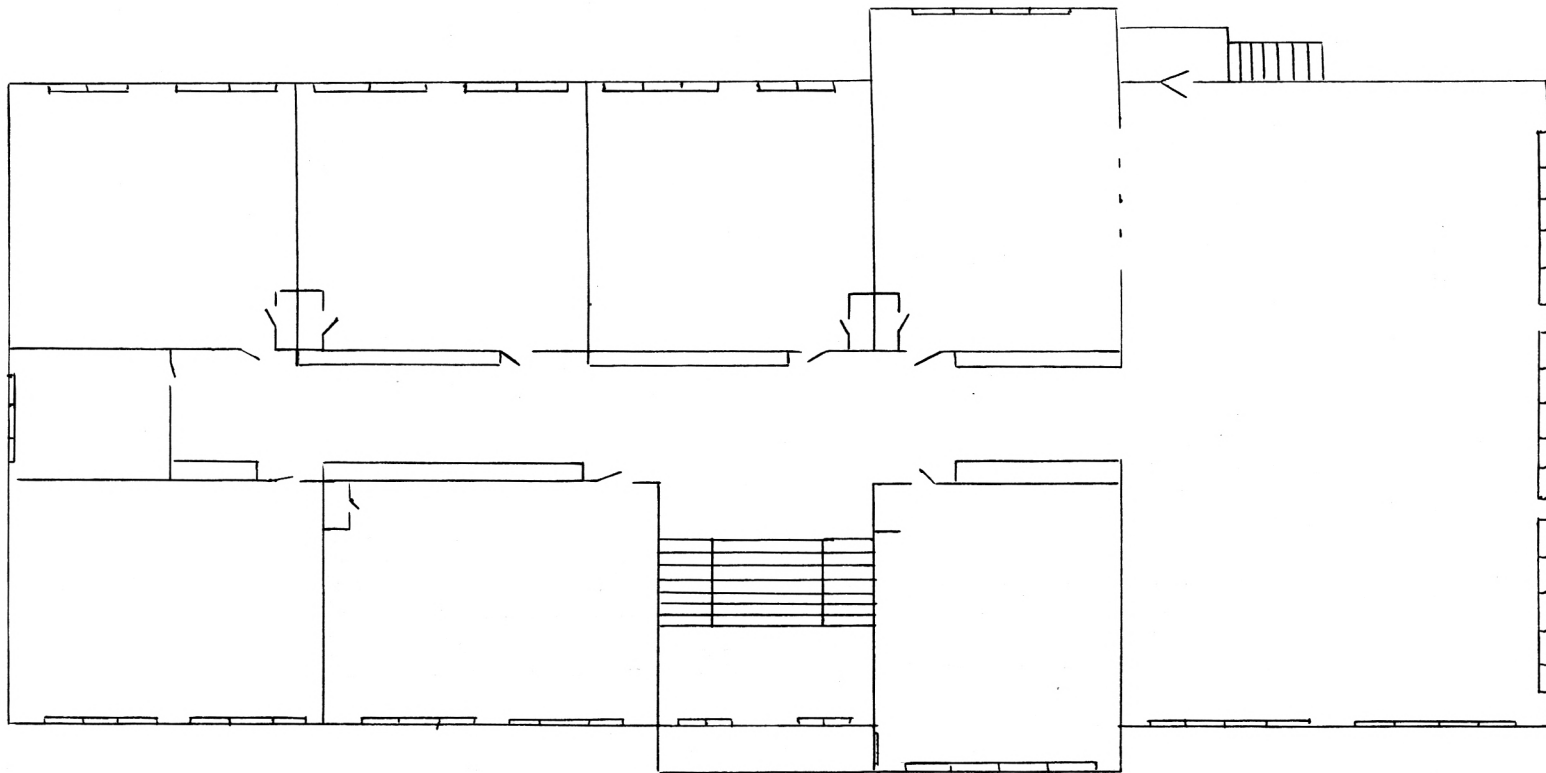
Floor plans of the second floor. Norton Community High School.
